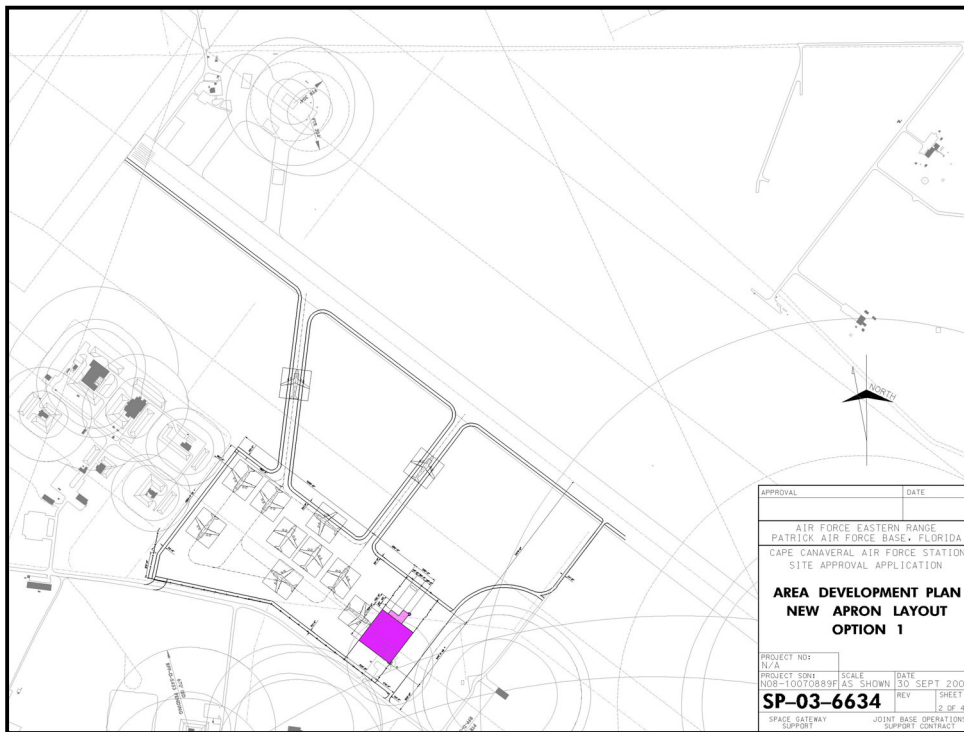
Site of proposed new facilities south of the Skid Strip (Option 1).
